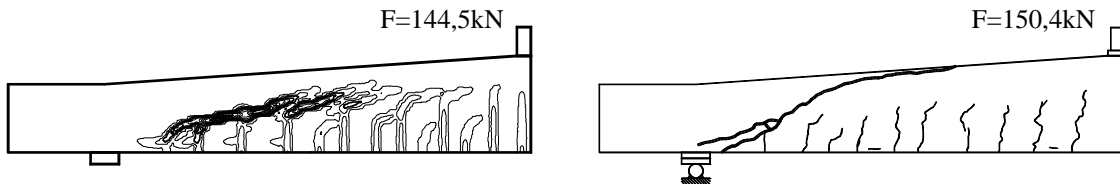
Crack propagation at failure of test beam 2L1 from Non-FEM and test
